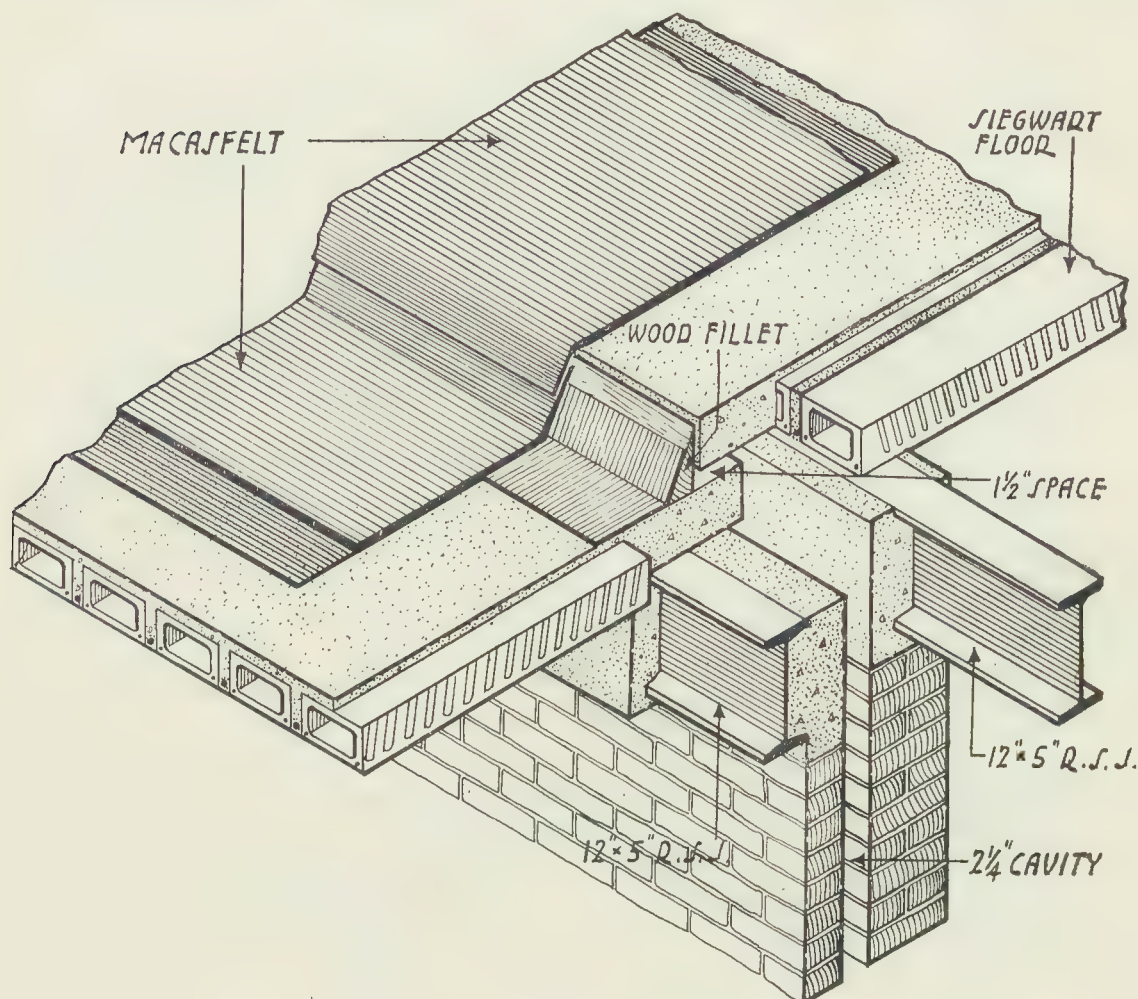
SOUND-PROOFING ADJOINING ROOFS
